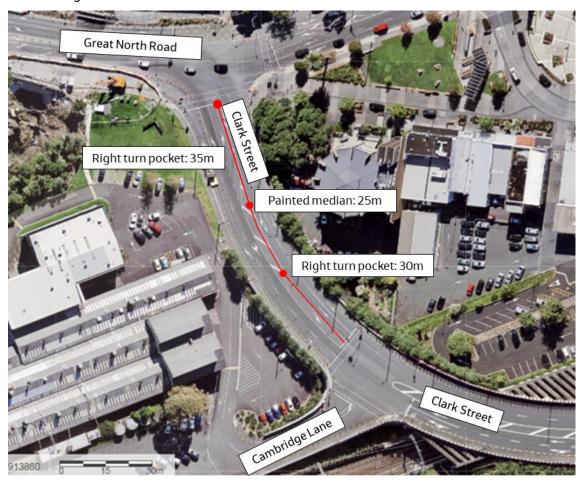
Clark Street / Cambridge Lane and Clark Street / Great North Road intersections with right turn stacking space
